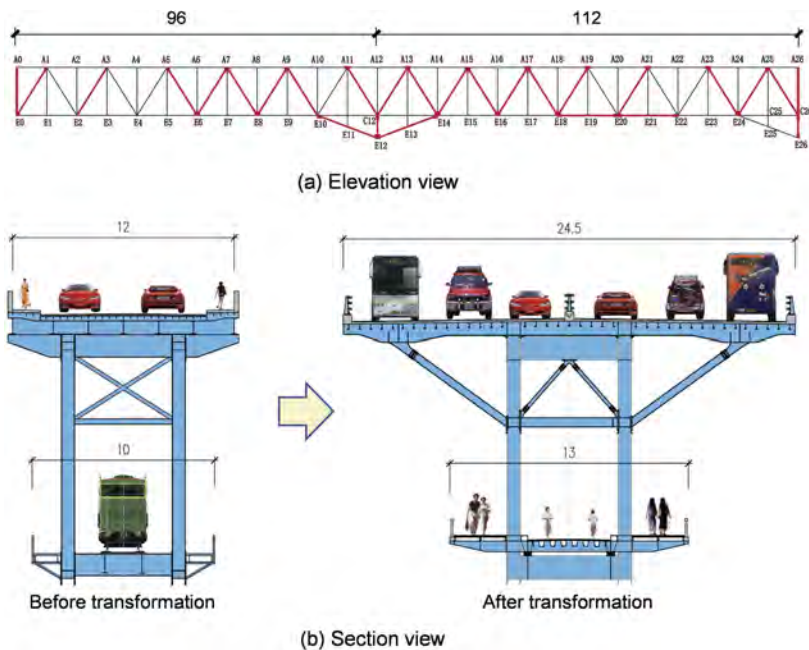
Overview of the strengthening and transformation project of Songpu Bridge (Unit: m).
